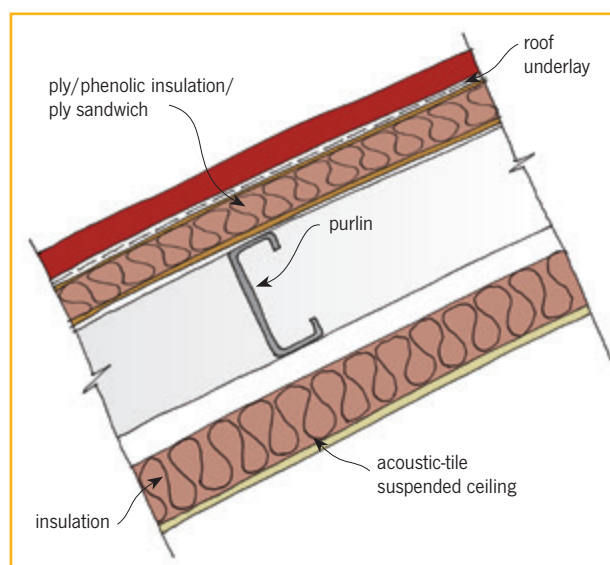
Roof specimen 3: A plywood/phenolic insulation/plywood SIP installed over the purlins but below the roof underlay.
